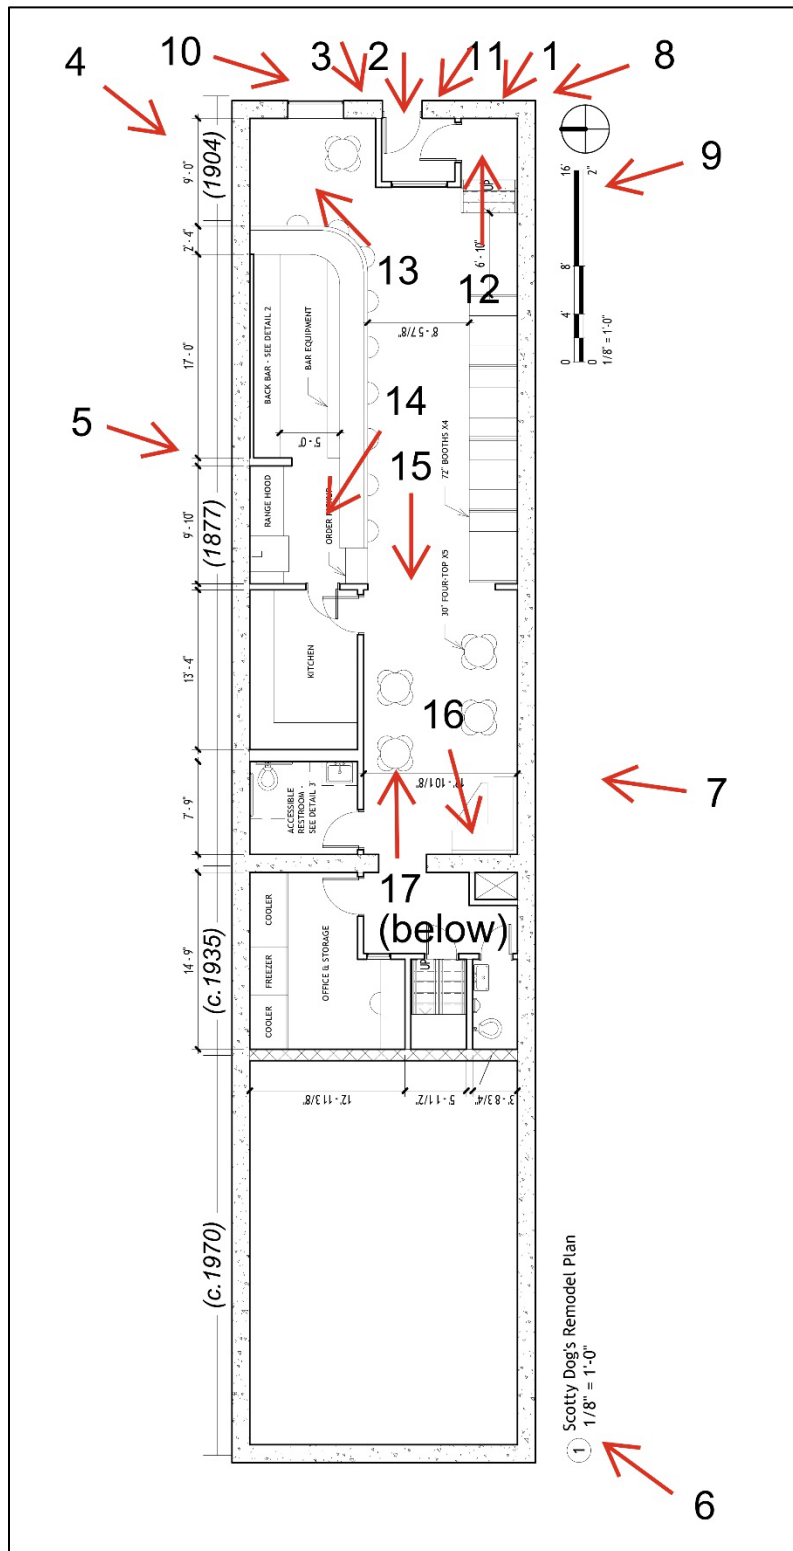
Sketch Plans – Photo Key / First Floor Plan, Scotty's Dog Tavern Remodel Plan, first floor. Drury Design, 2025.
